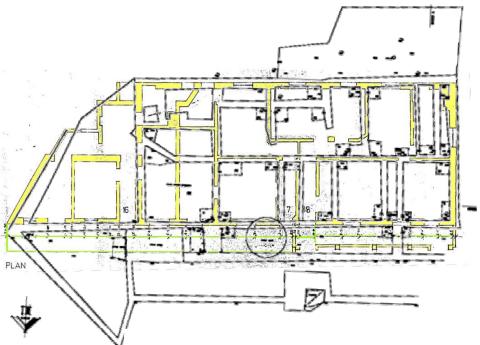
An overlay of the floor plan of the dwelling c1970 and the surveyed drawing of the site.
